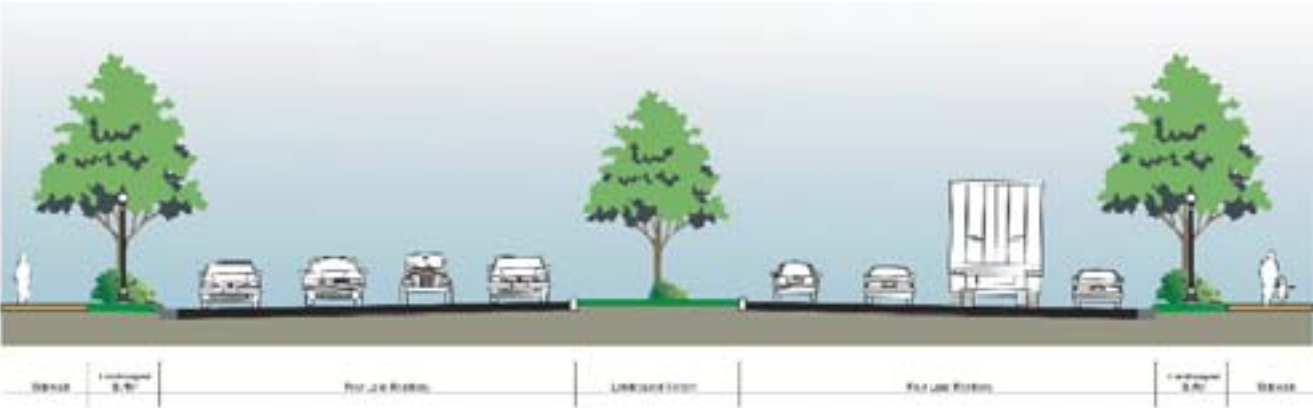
Typical Cross-Section Between East Capitol Street and Eastern Avenue
